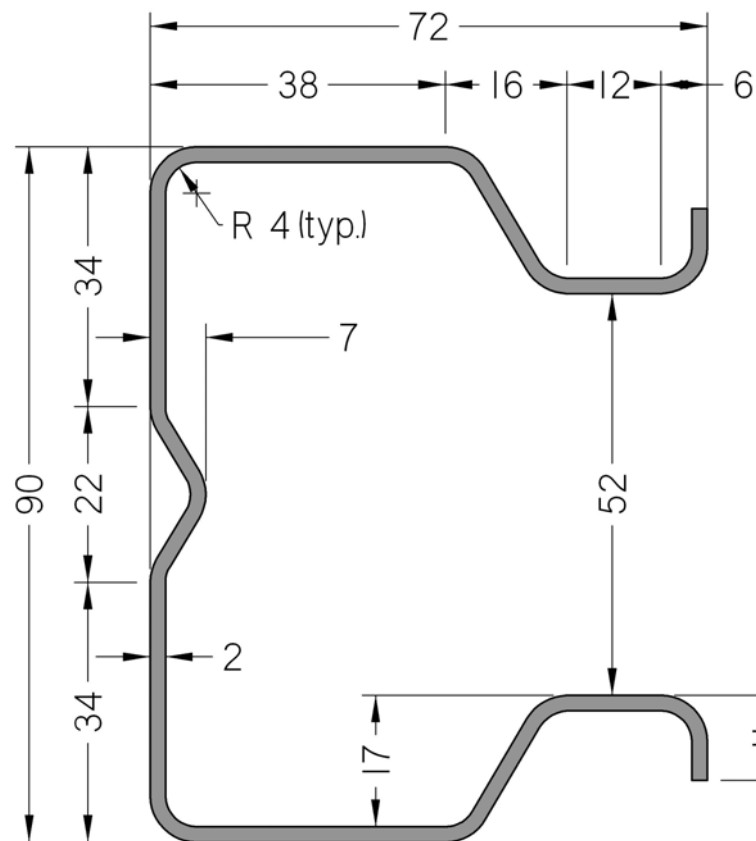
Cross-section dimensions of a typical steel storage rack upright, 90 mm wide, 2 mm thickness
